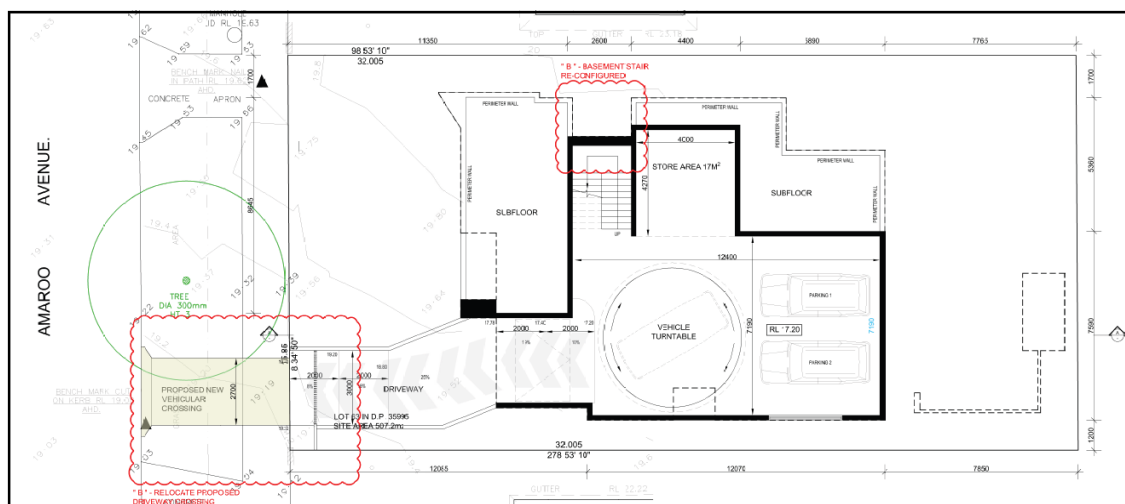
Basement plan 1364 – 01 Rev. B (IDAP assessed 29 April 2022)
